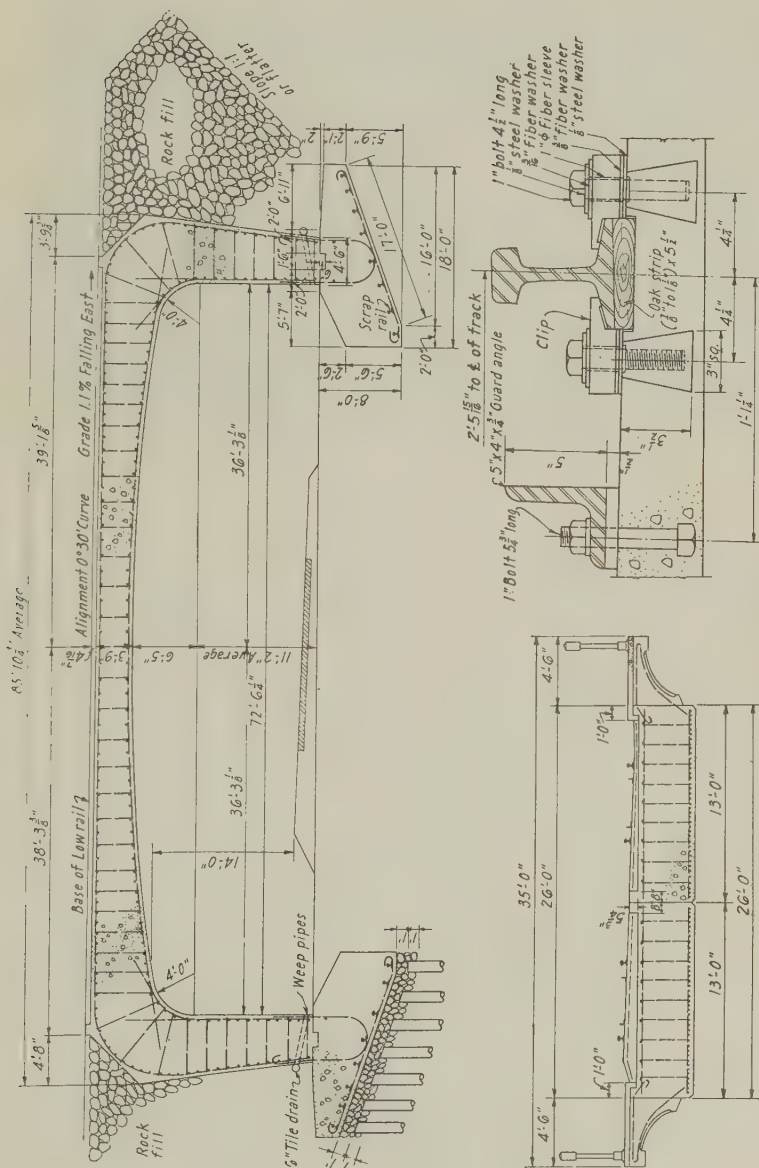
FIXED FRAME BRIDGE, VAUDRIEUL, QUEBEC
